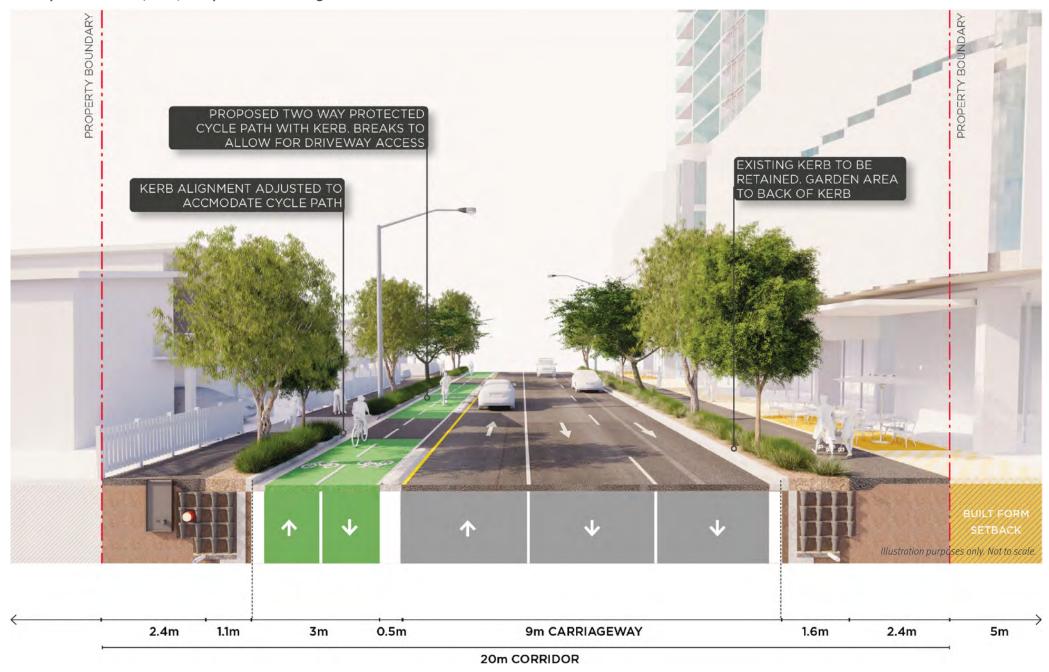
Cross section - Leopard Street - subtropical boulevard (minor)
